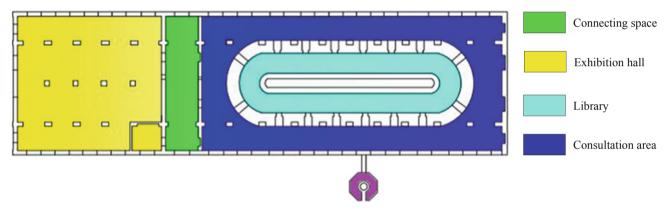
Recovery plan, ground floor plan (drawing by M. L. Longo)
